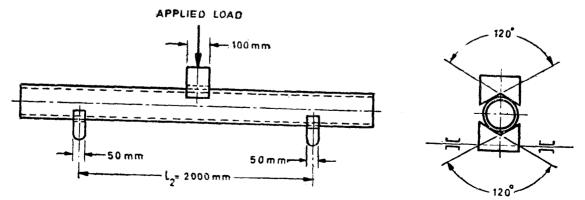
LOADING IN LONGITUDINAL BENDING TEST
